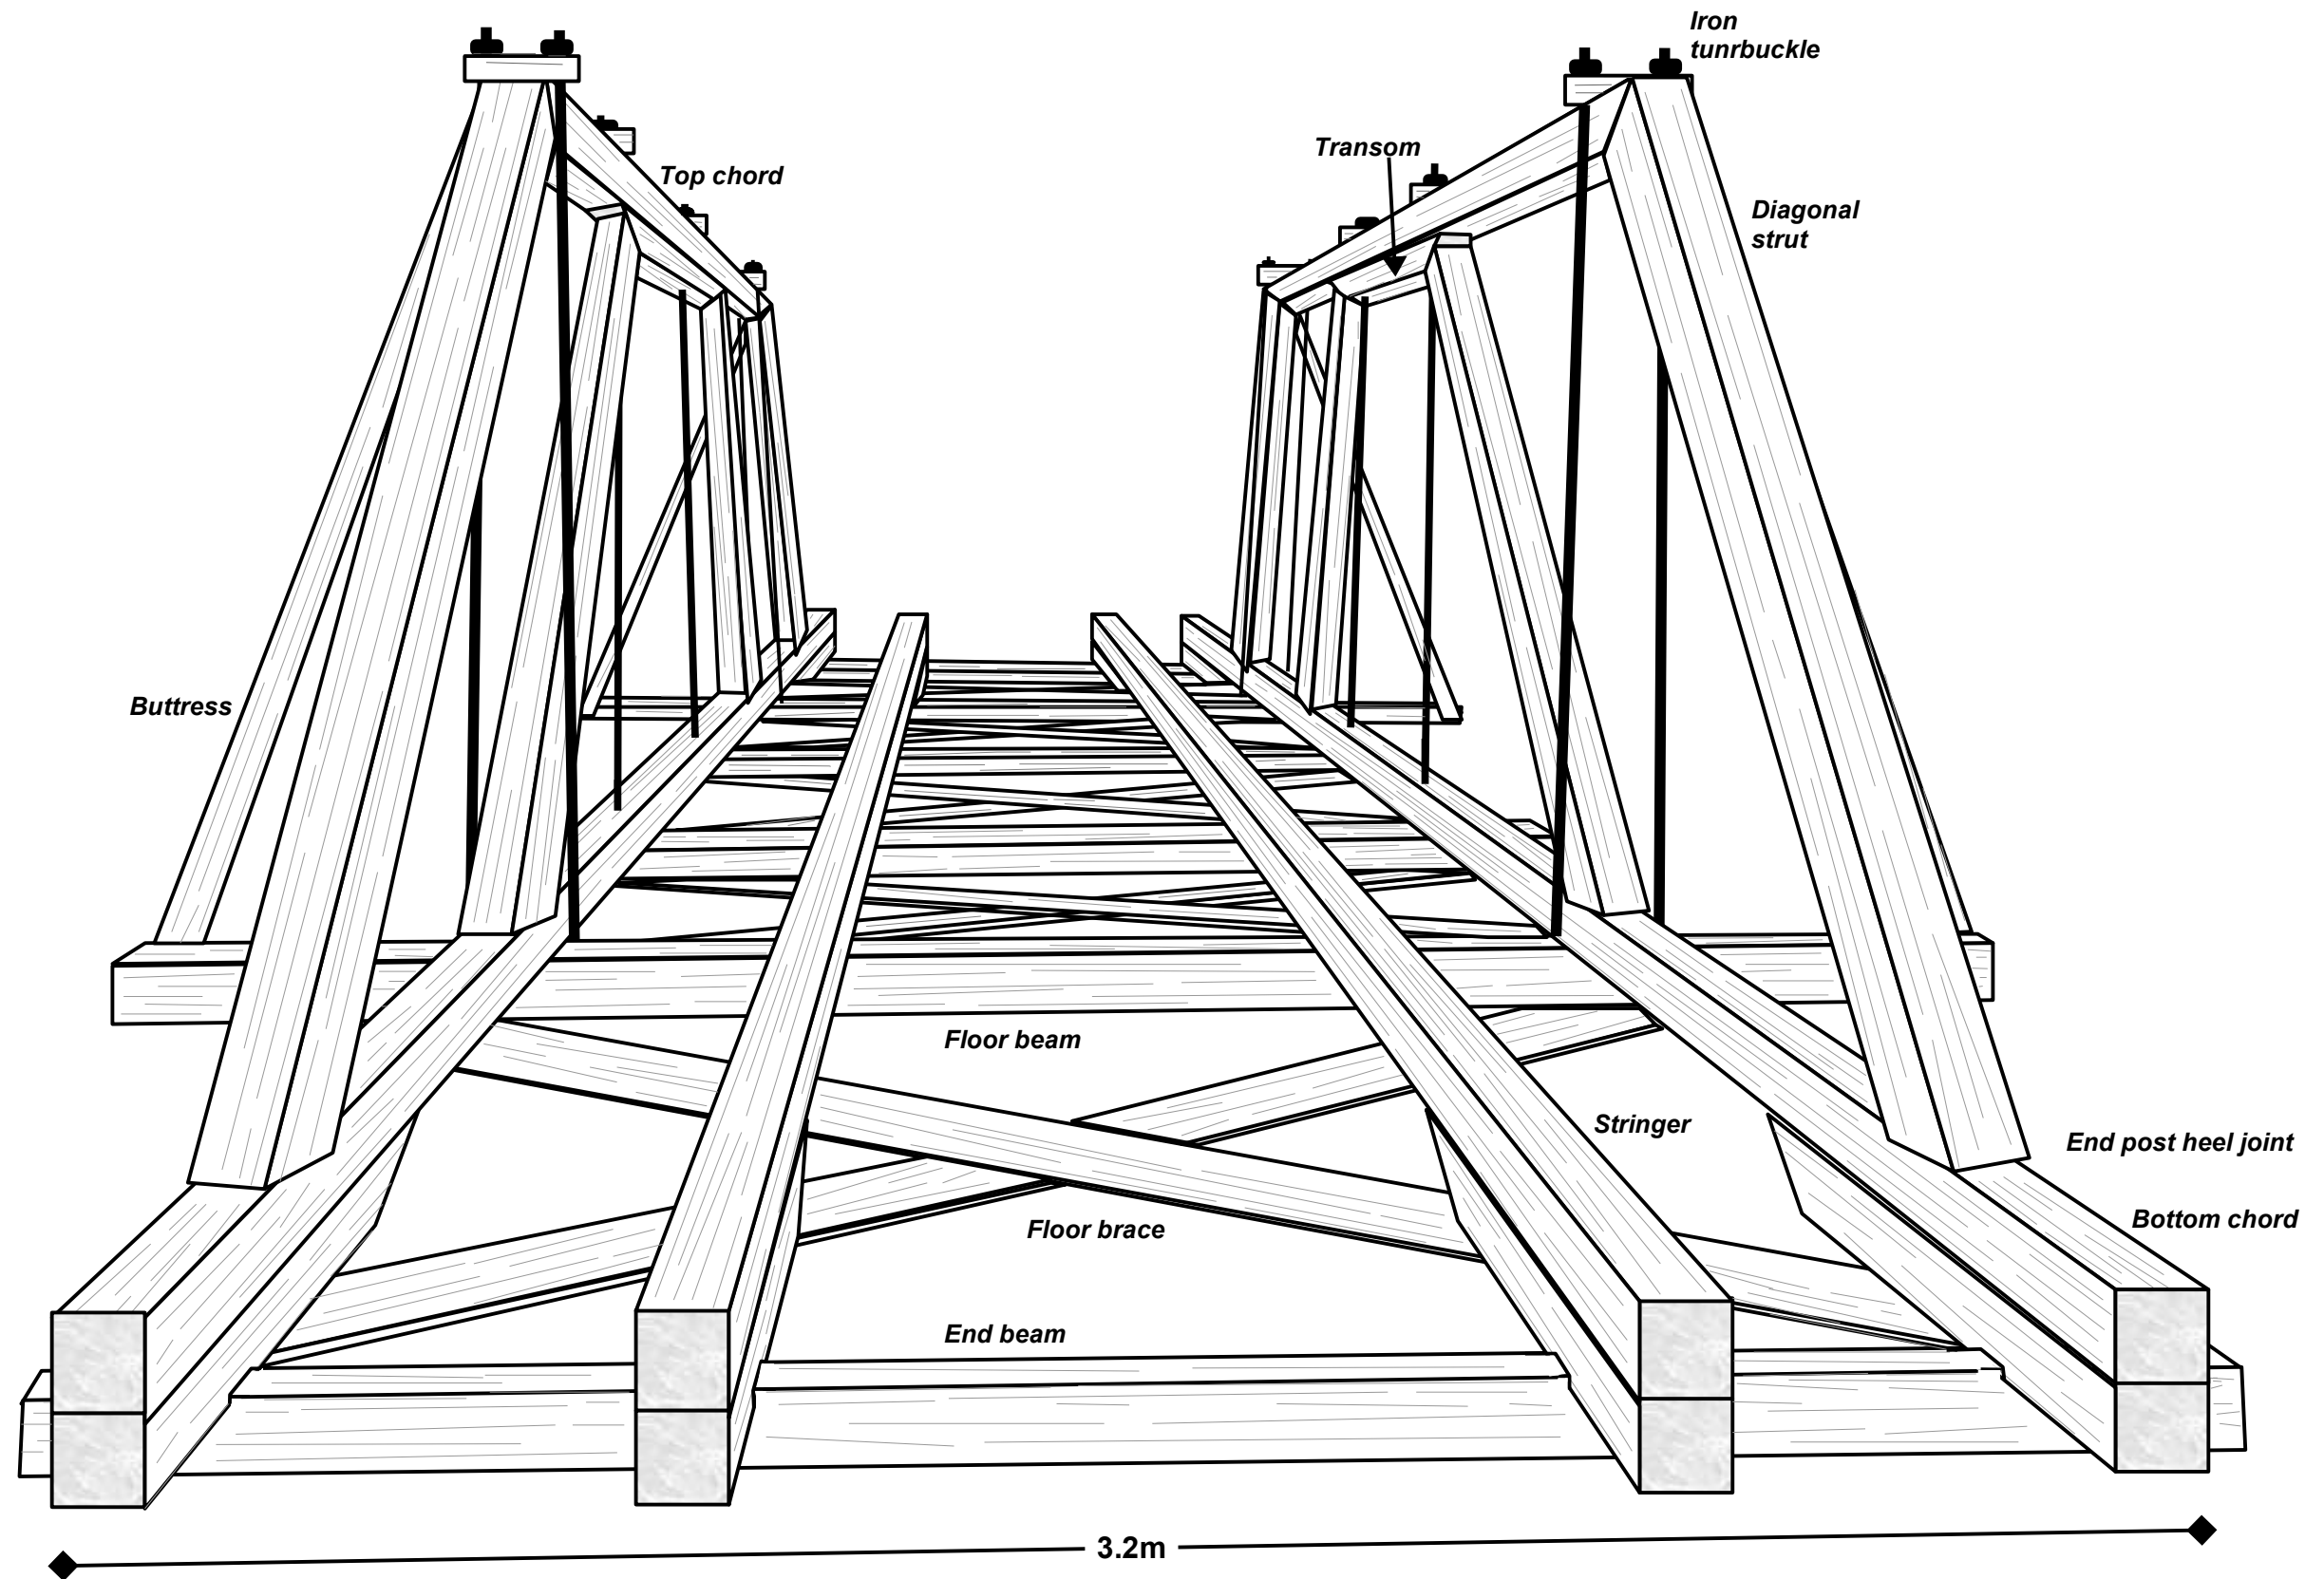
D-3 projection of wooden elements of bridge showing underlying structure (deck timbers removed for visibility)
